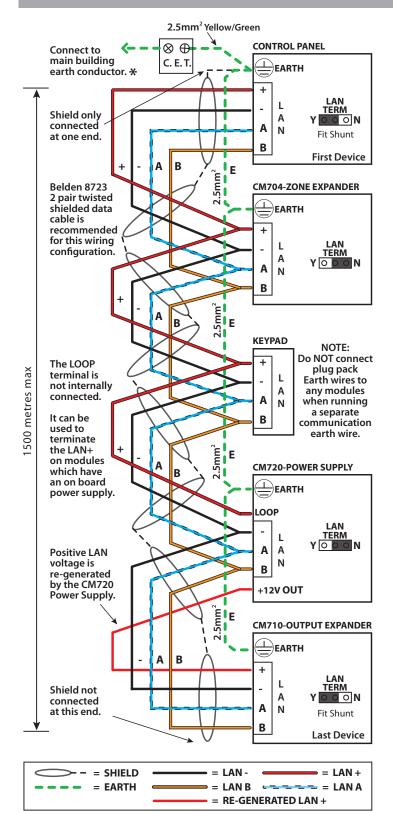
LAN Connection Using Twisted Pair Cable Recommended for LAN Lengths greater than 300 metres.
